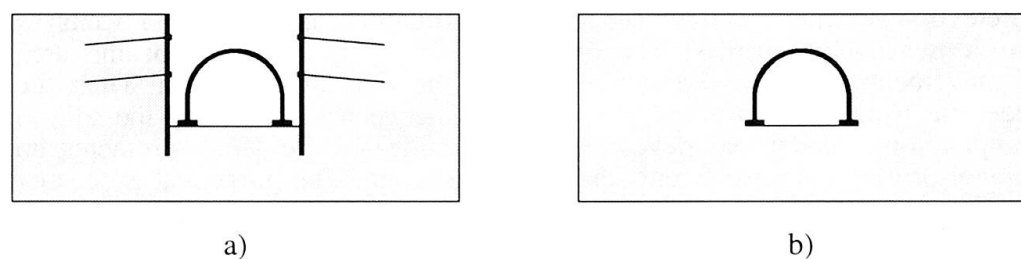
Cut-and-cover tunnel in an excavation supported by pile walls
